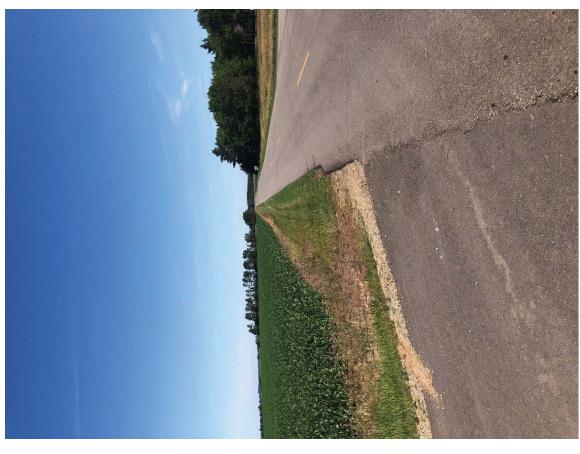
Intersection of 65th Ave and 163th Street. Orientation north.
